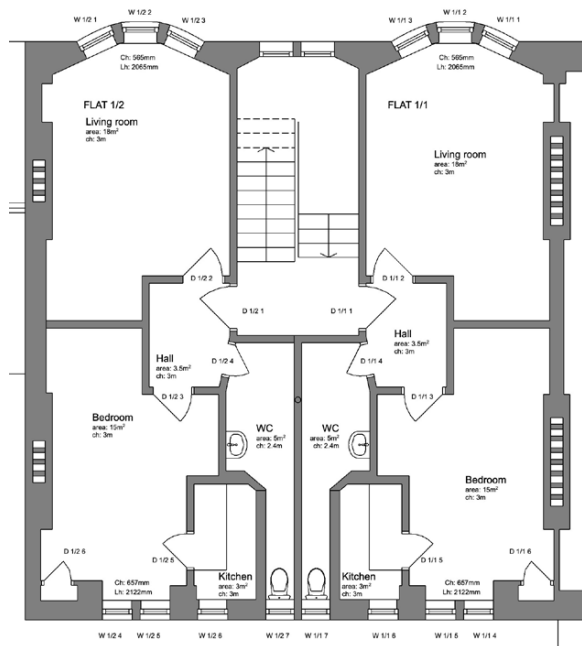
Floor plan of the building. Source: John Gilberts Architects.
